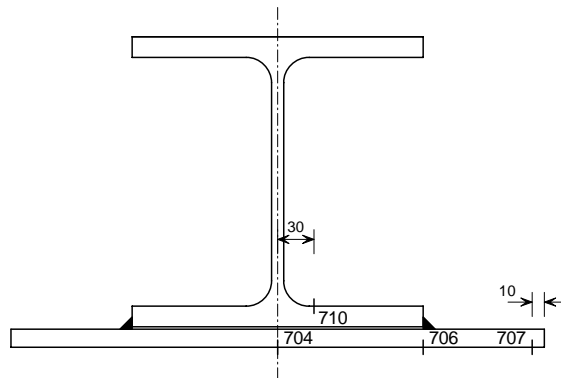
Internal beam transverse arrangement of thermocouples at position D
